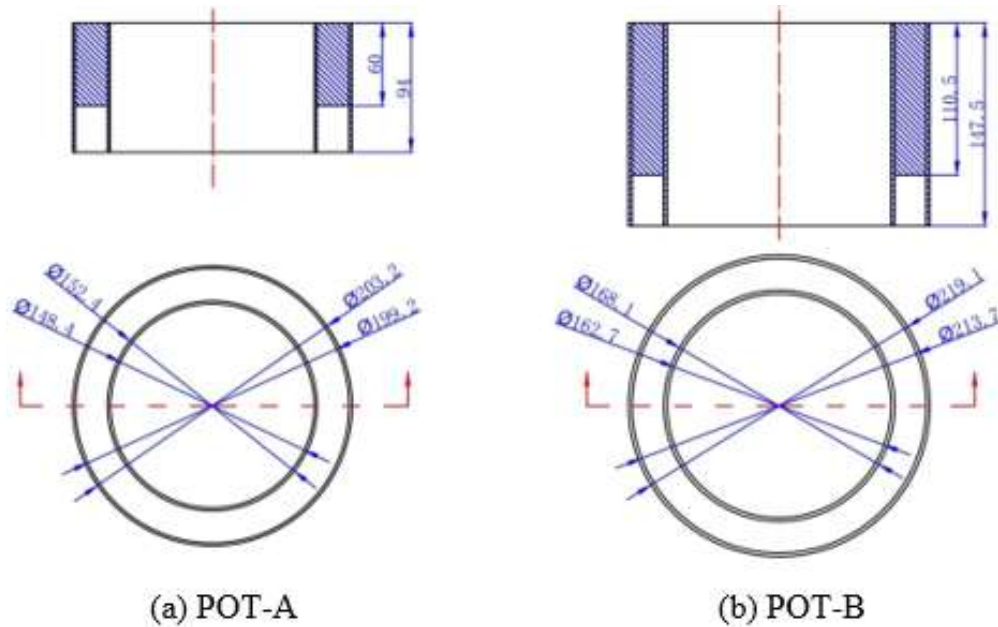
Geometries of the push-out test specimens (unit: mm)
